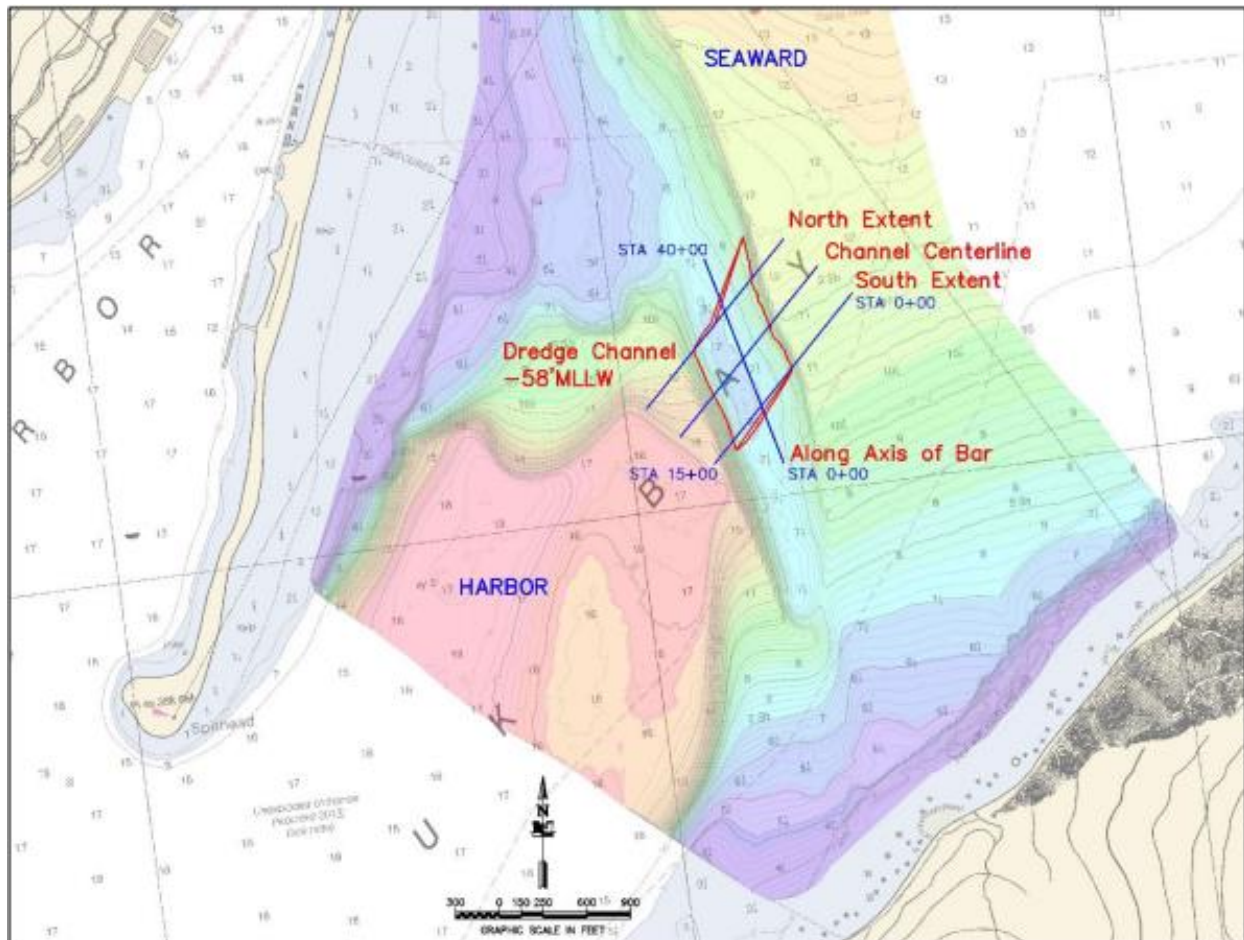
Plan View of Dredge Channel at -58 feet MLLW Depth
